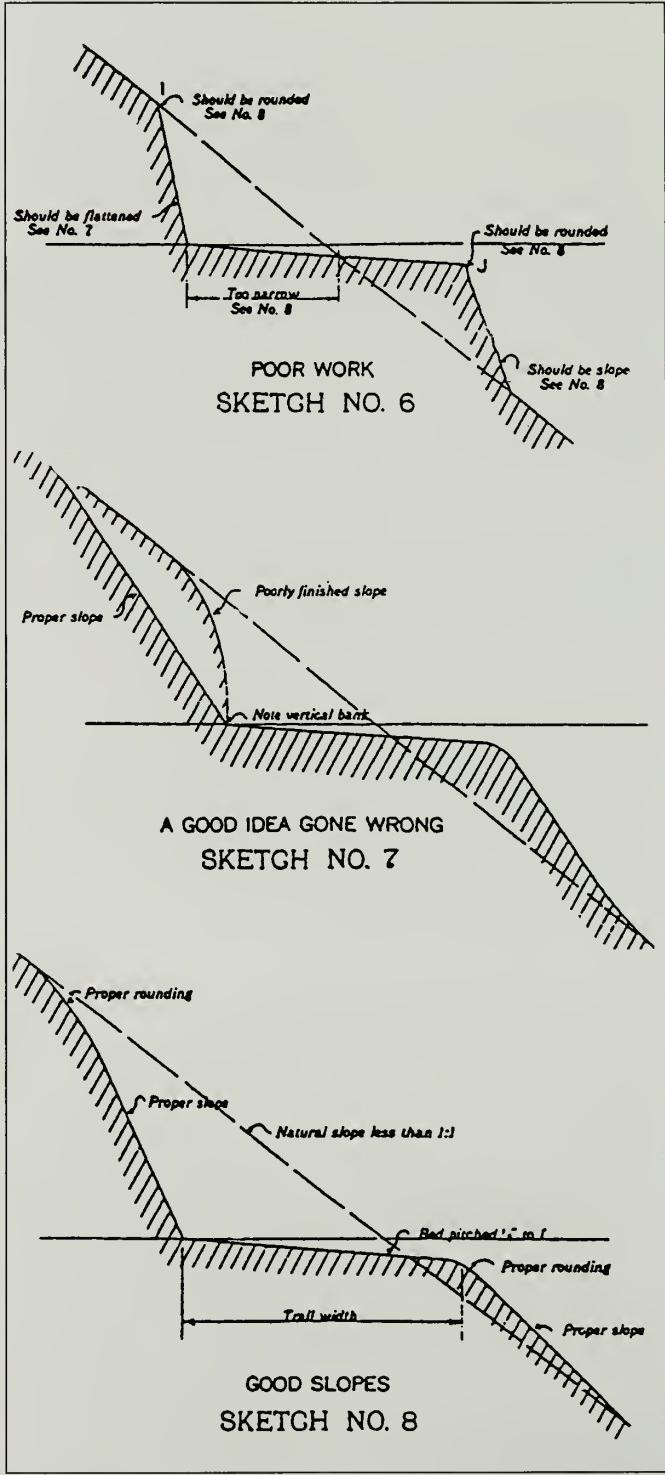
CCC details for the correct way to finish the slopes adjacent to a bench cut.
